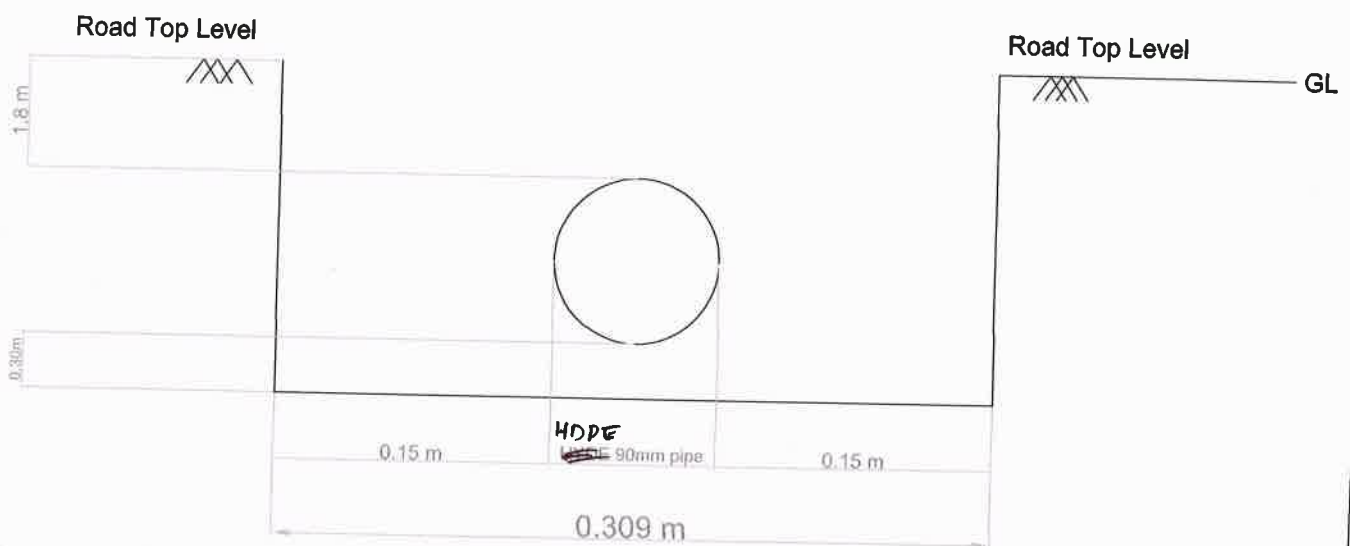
INSTALLATION OF CASING PIPE FOR CROSSING THE ROAD
